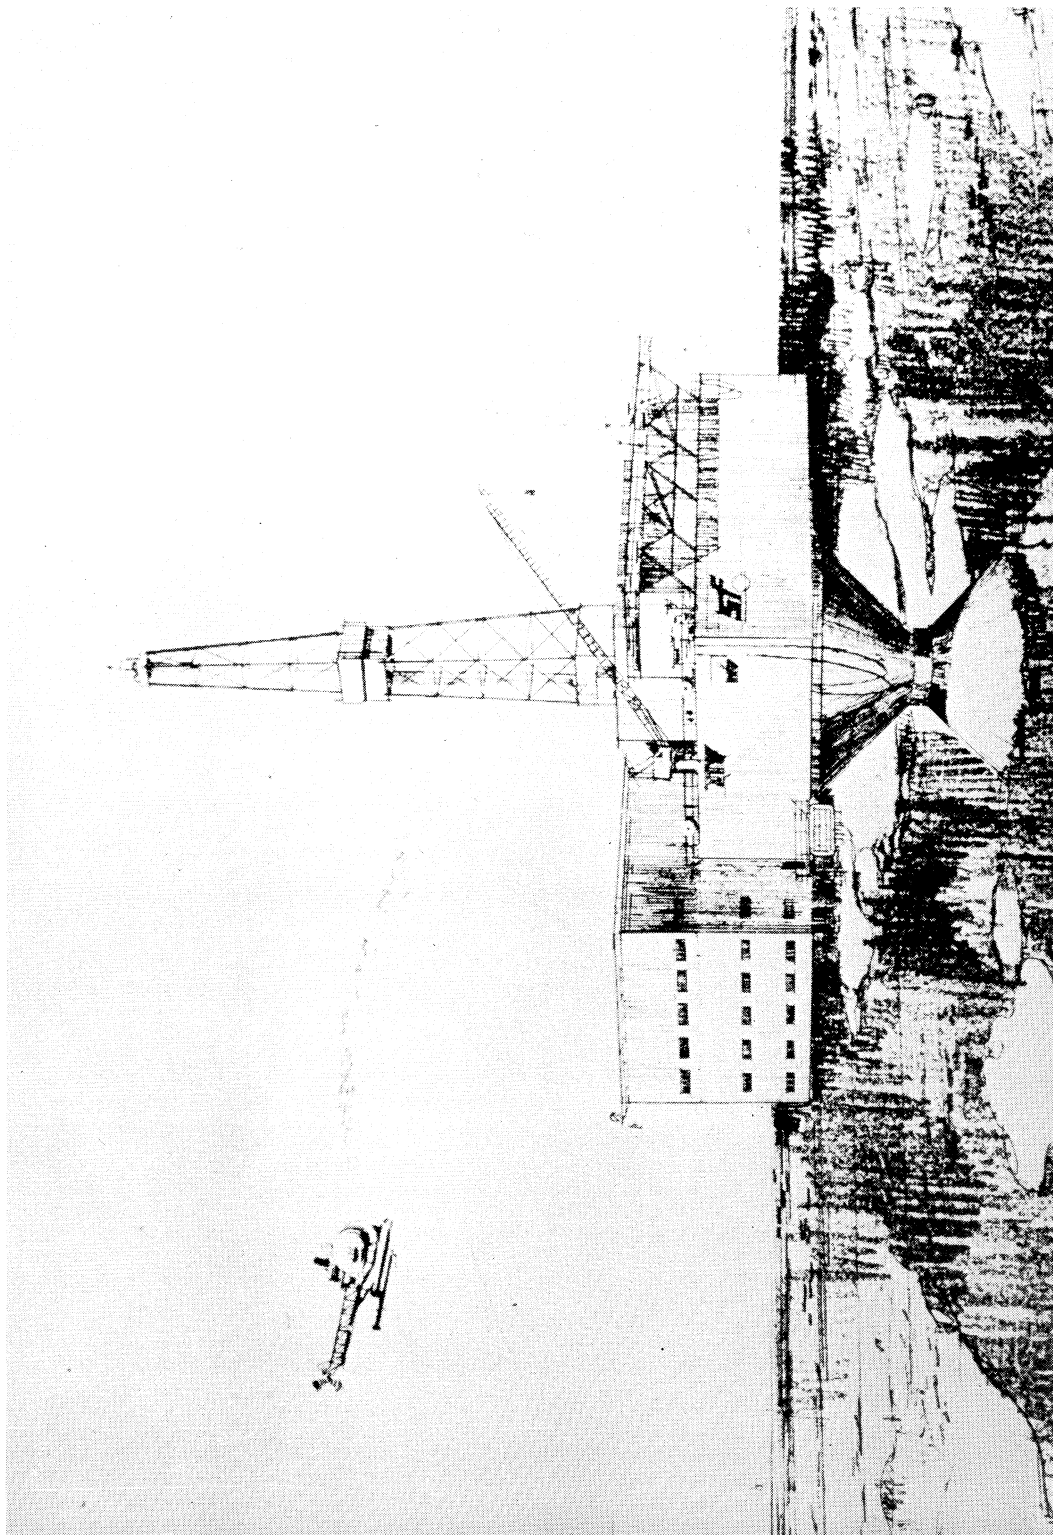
CONCRETE CAISSON IN PLACE TO SUPPORT DRILLING AND PRODUCTION OPERATIONS
